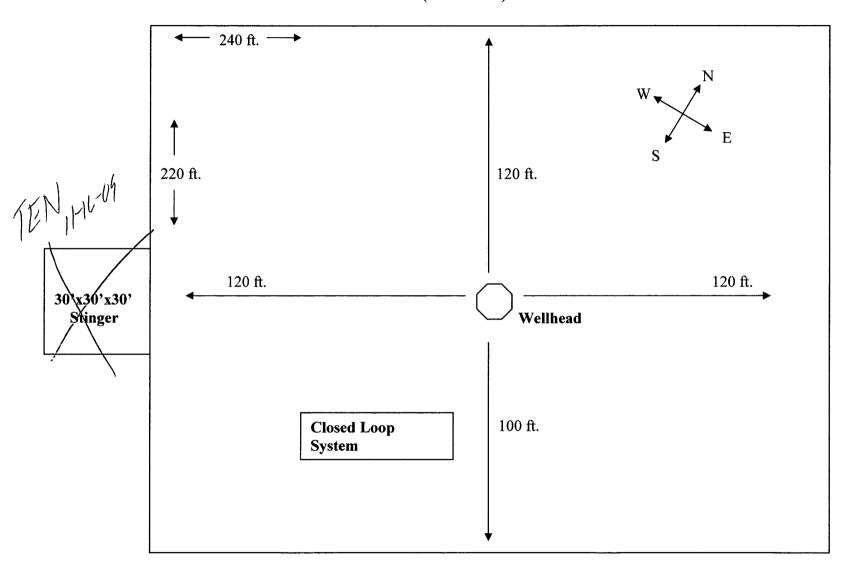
DRILLING RIG LAYOUT – DURING CONSTRUCTION
